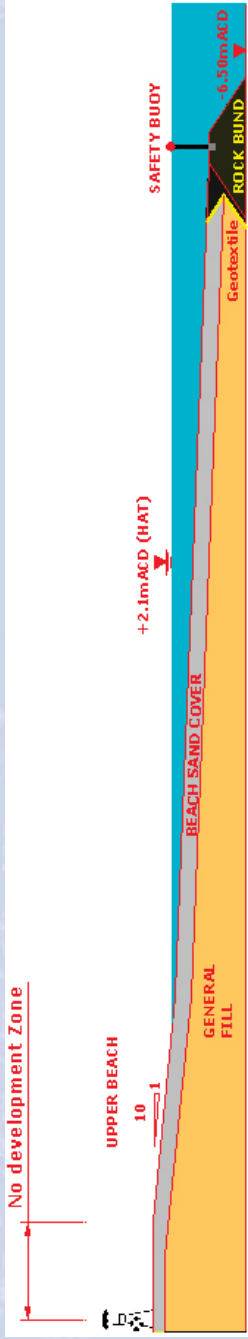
TYPICAL BEACH CROSS SECTION
